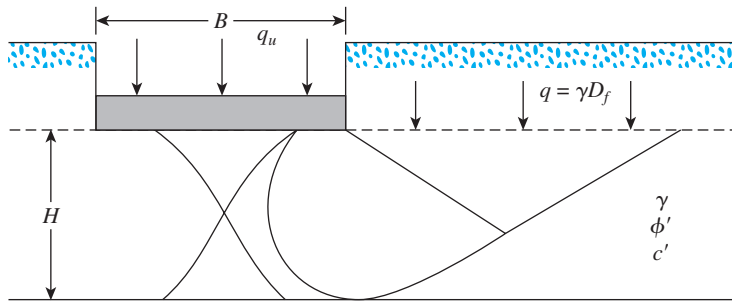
Failure surface under a rough, continuous foundation with a rigid, rough base located at a shallow depth
